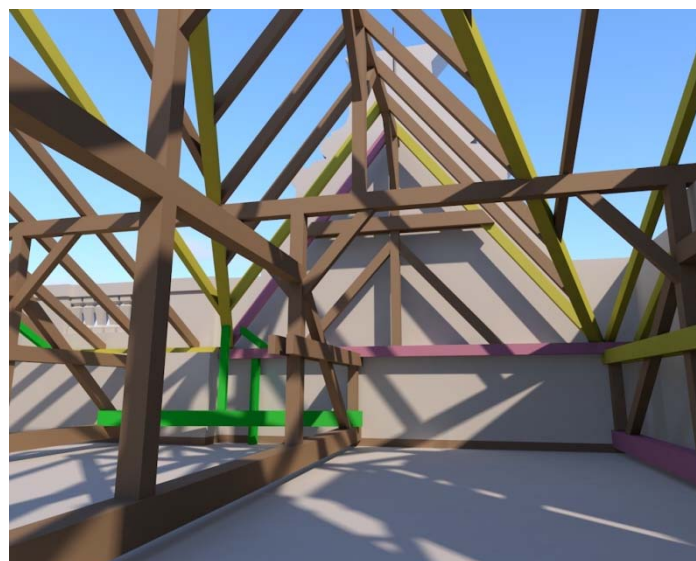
As-built state - 3D model with highlighted damaged elements of truss
